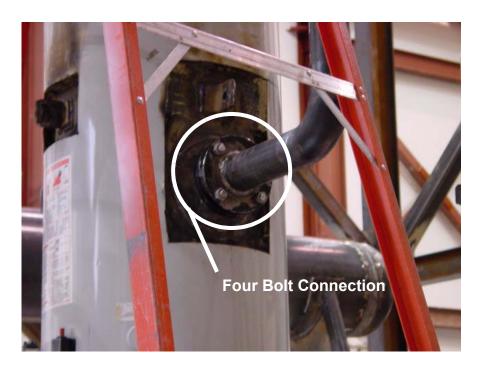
Four Bolt Flanged Connection to Water Heaters
